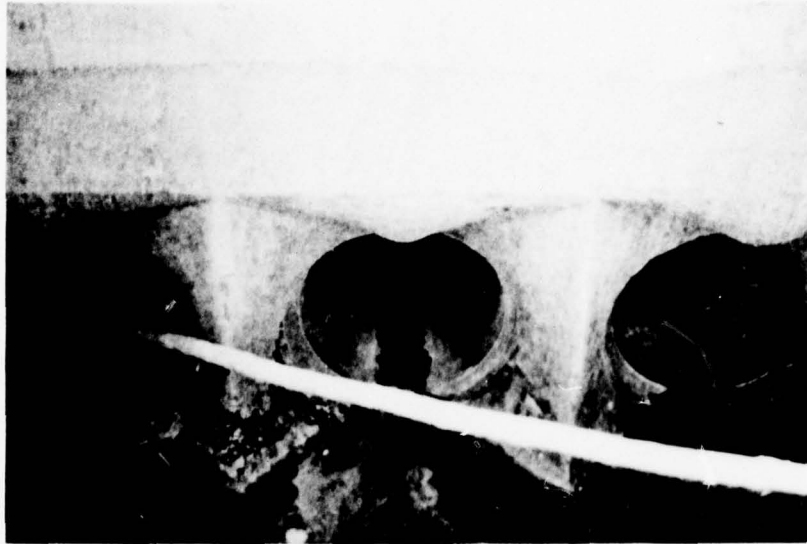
Three 42-inch diameter concrete pipe conduits in spillway drop-inlet structure. Note thin log resting across outlets.
